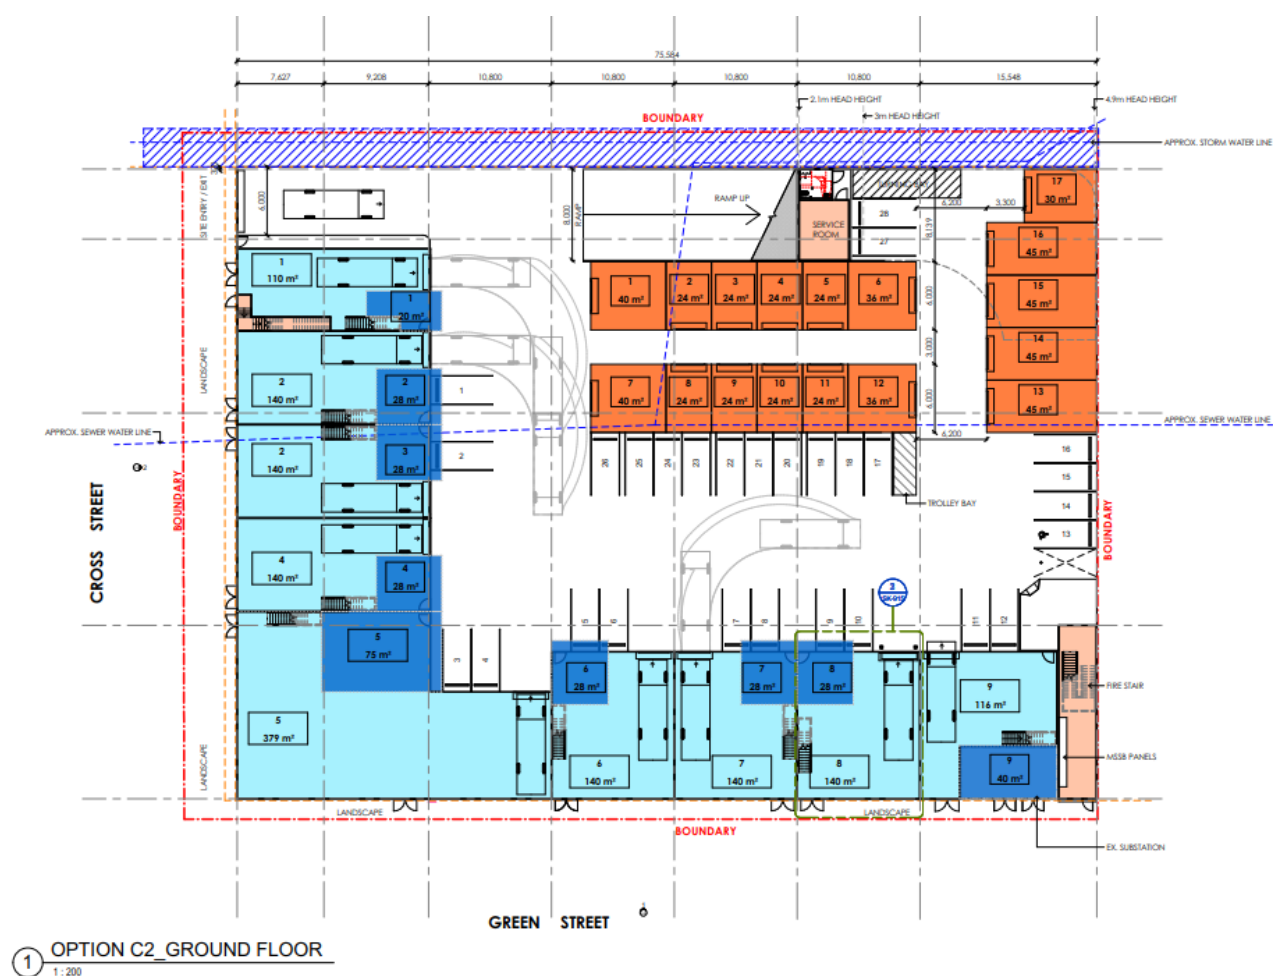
Proposed Architectural Layout (Pace Architects)
